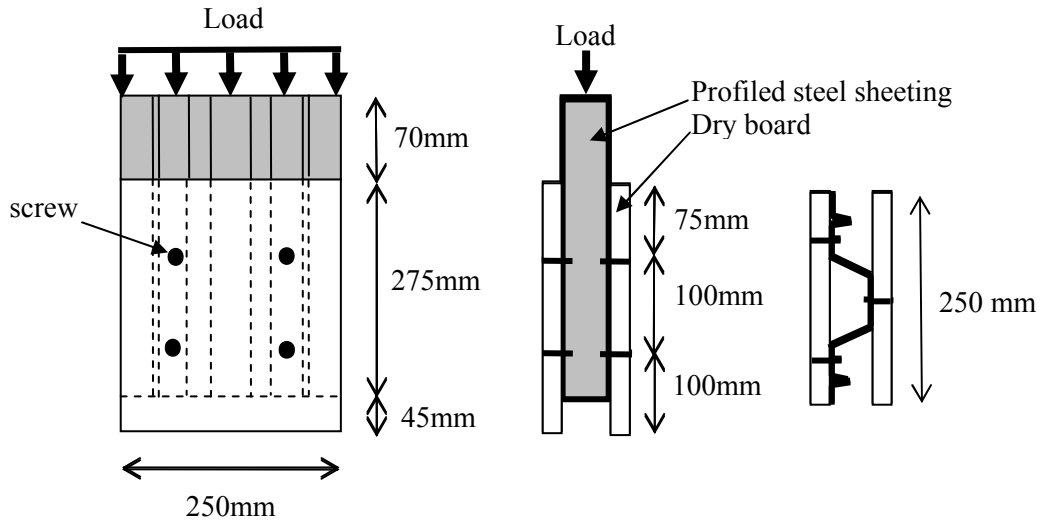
Schematic Drawing of Peva-Cemboard and Peva-Plywood Specimens; Starting from the Left – Elevation, Side and Cross Sectional Views.
